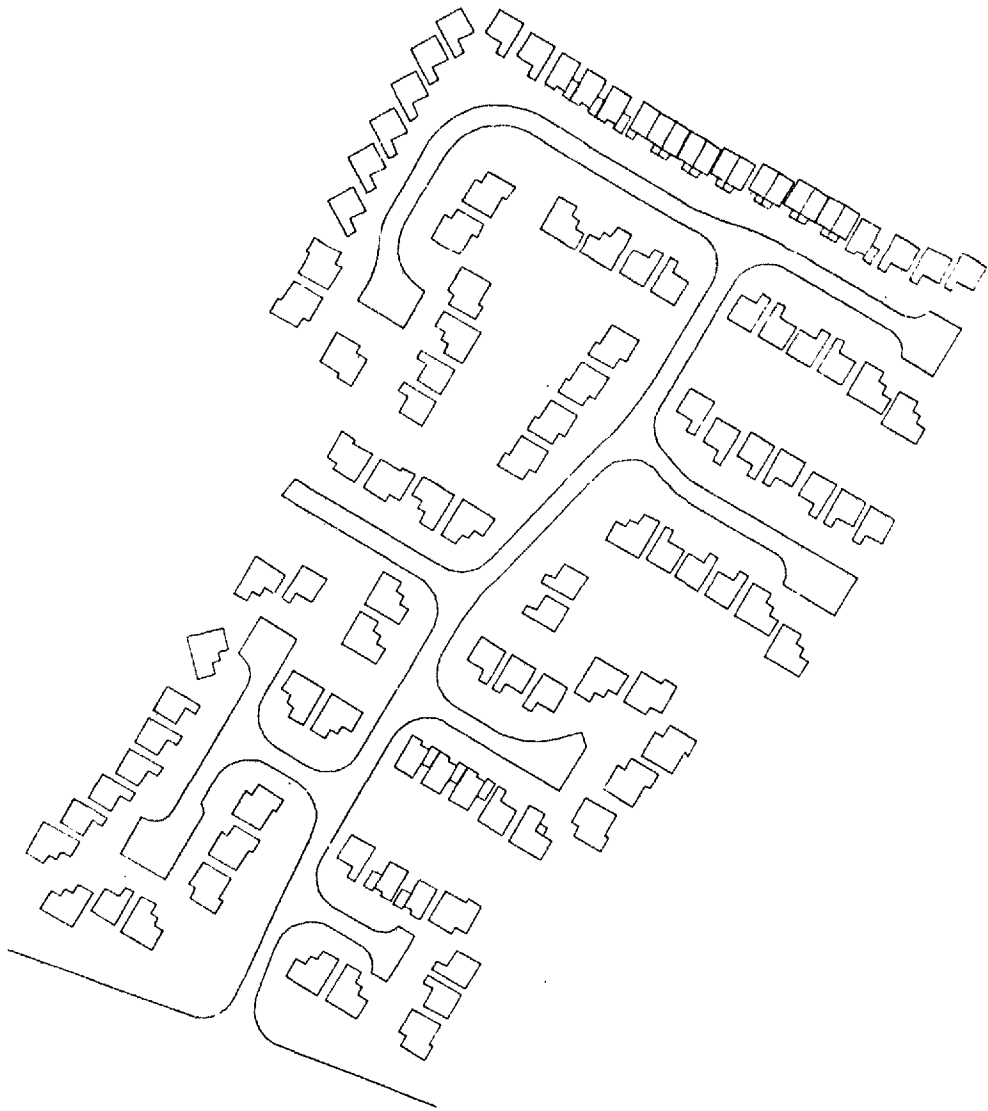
A BUILDING LAYOUT AT THE BASIC DESIGN LEVEL
